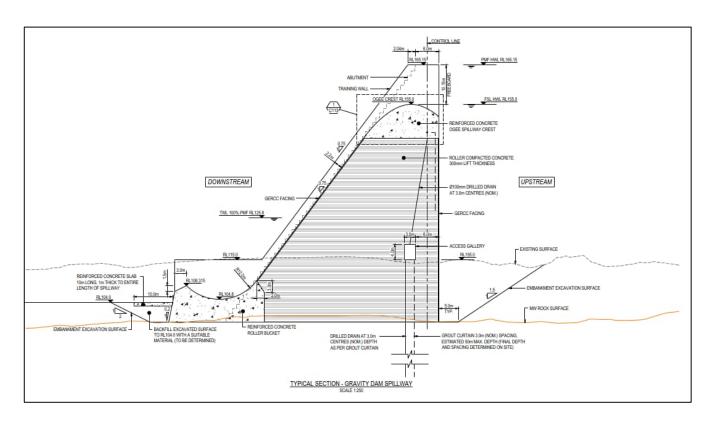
Proposed new Borumba dam spillway typical cross section (GHD, 2022)
